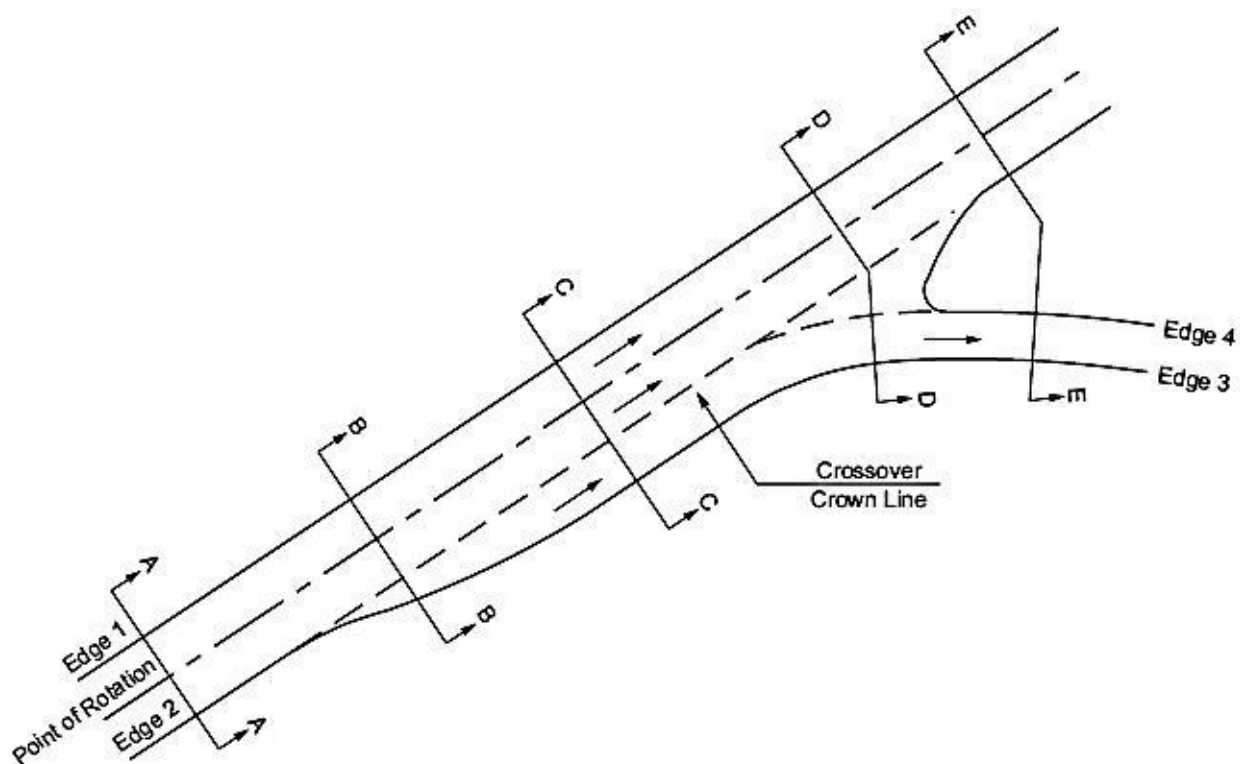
/4: Development of Superelevation at Turning Roadway Terminals [4, p. 651]
